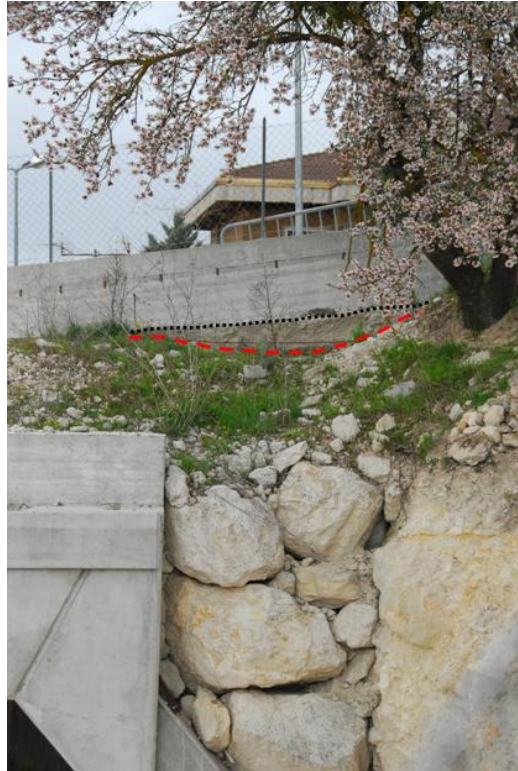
Settlement trough reaching 10 to 15 cm maximum, relative to the spanning parapet wall foundation (42.358N 13.415E).
